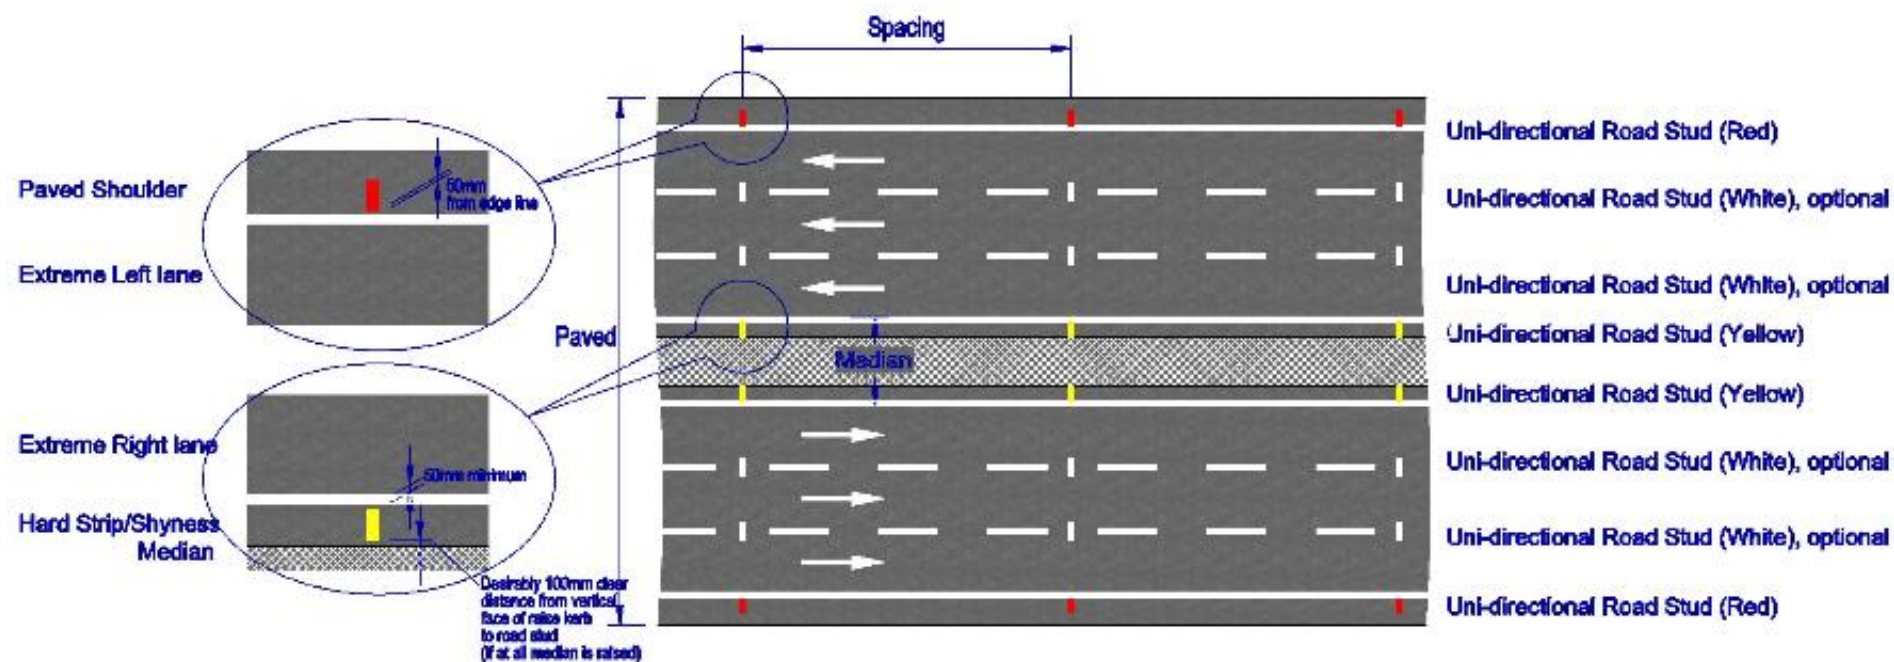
Placement, colour and spacing of road studs on divided roads
